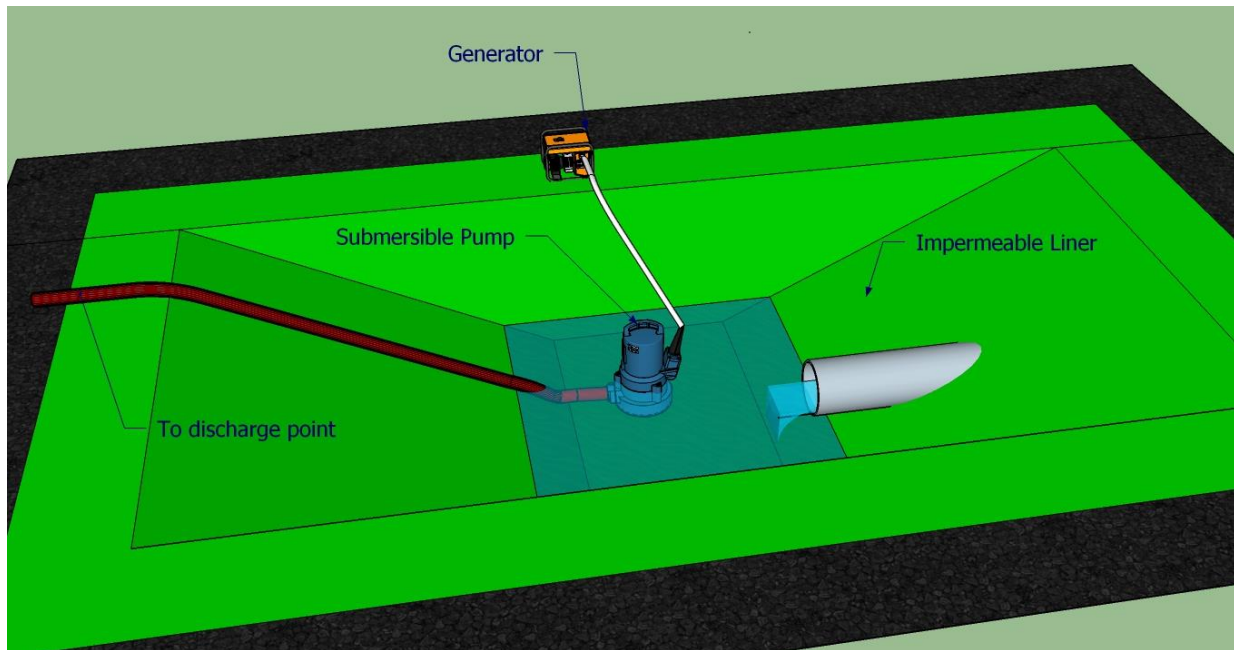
Example of Open Pipe Flushing Technique Water Disposal Setup
